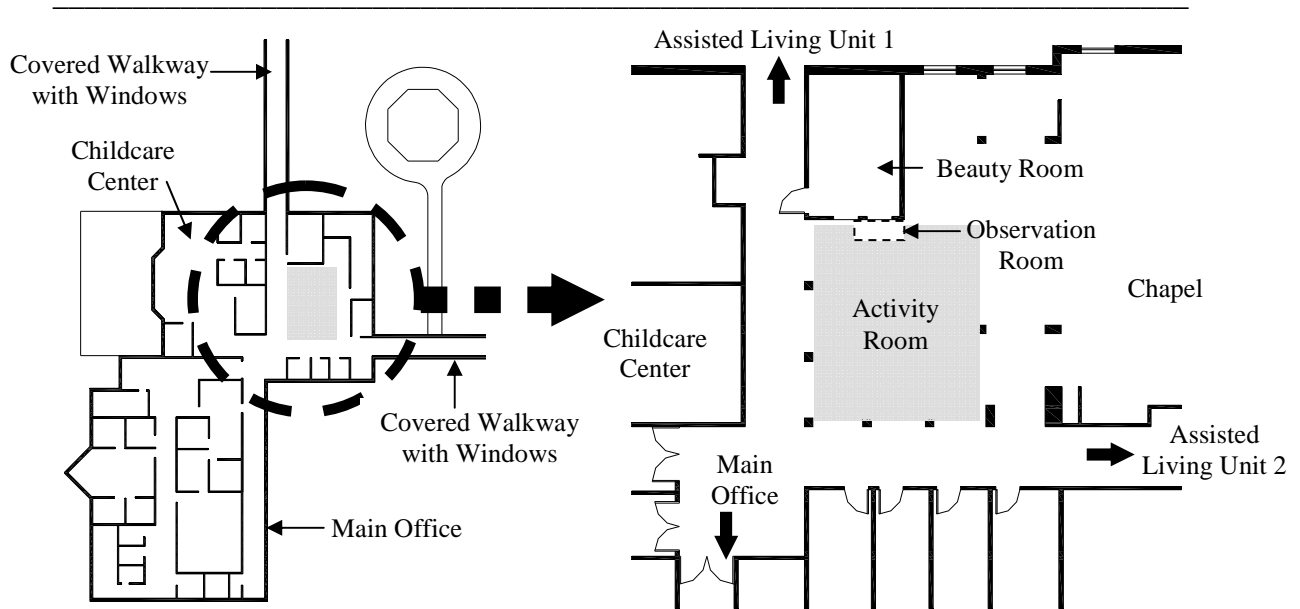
Architectural Floor Plan of the Activity Room used for Design Intervention
